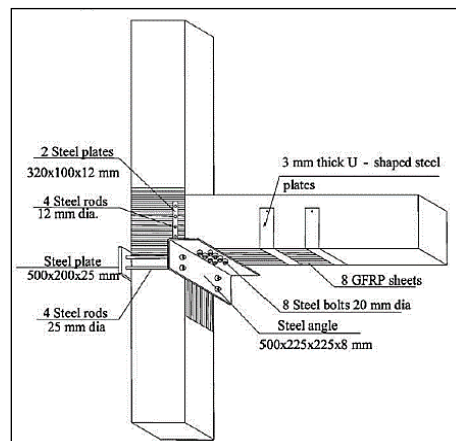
Specimen TR2 confinement scheme (GFRP bonded at the bottom beam face with two U-shaped of steel plates and steel angles at the lower beam-column corner. The joint was wrapped with two U-shaped of GFRP anchored by steel plates and tie rods driven through the joint) (El-Amoury et al., 2002)
